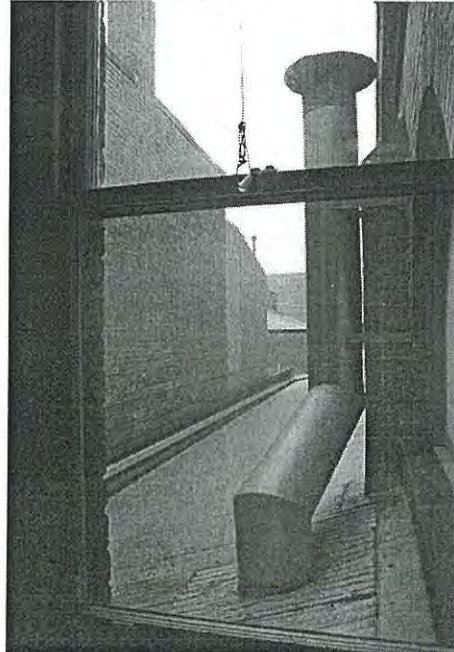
Exterior, Exchange Hall, north elevation (clerestory level), west end showing introduced zincalume ventilation stack which is causing rusting at the junctions of the base cladding and the roof cladding.
